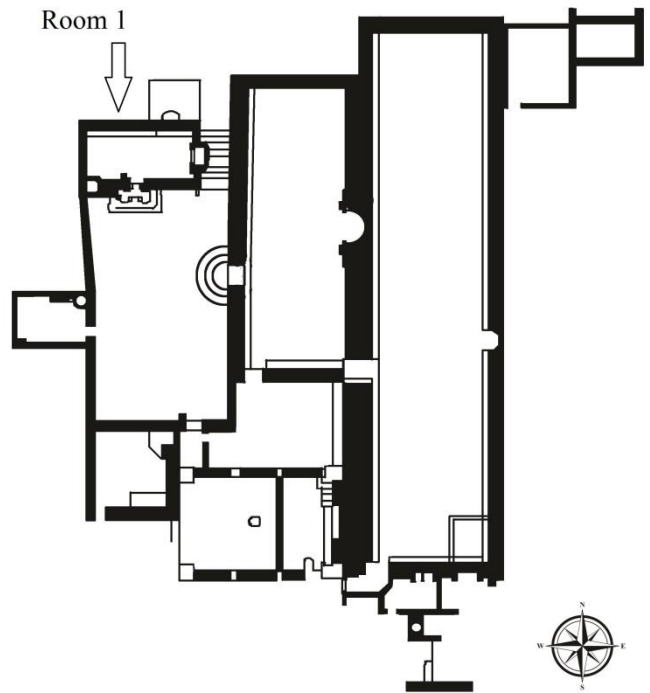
Plan of “Rooms” (Room 1 in top left corner) (adapted from MIFAO 59:1, Plate I)
